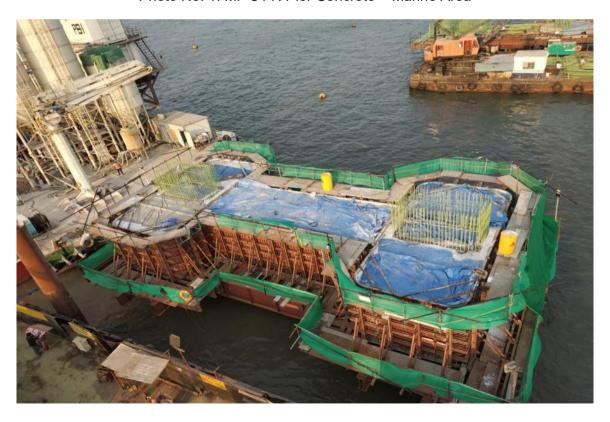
MP 104 Pile Cap Concreting- Marine Area
